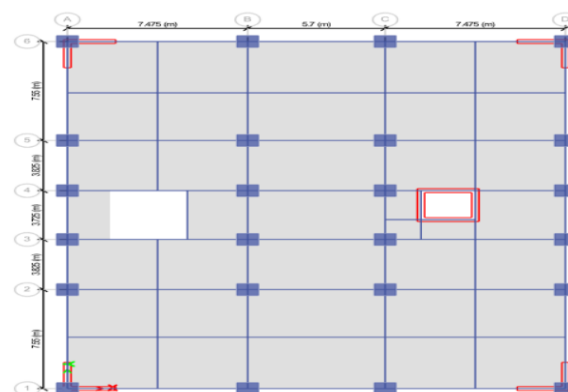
Typical Plan view of 4, 8 and 16 Storey Building Models.
